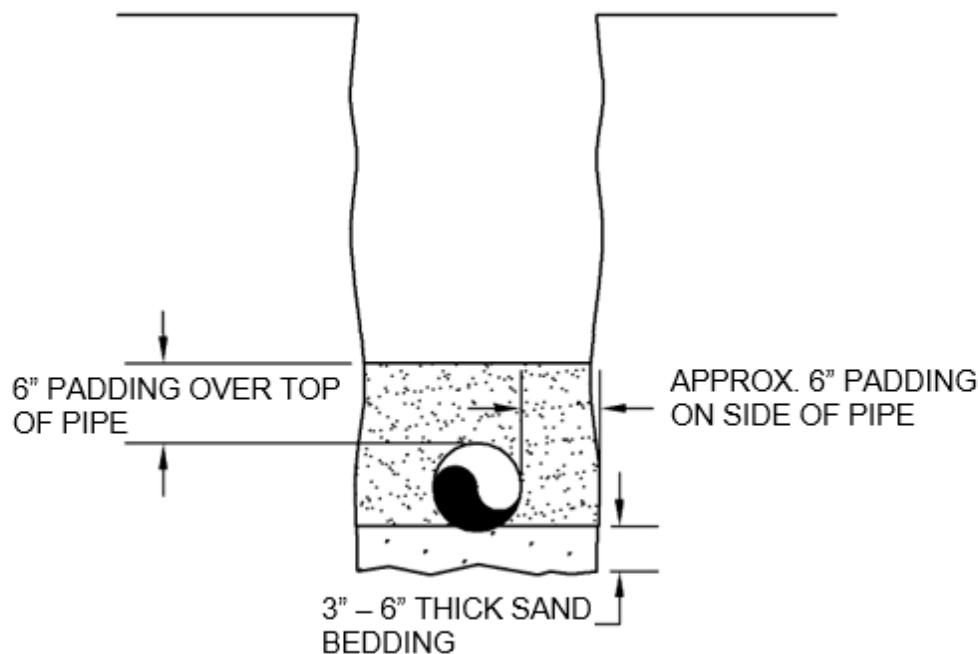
Bedding and padding for continuous support and protection of pipe installations
